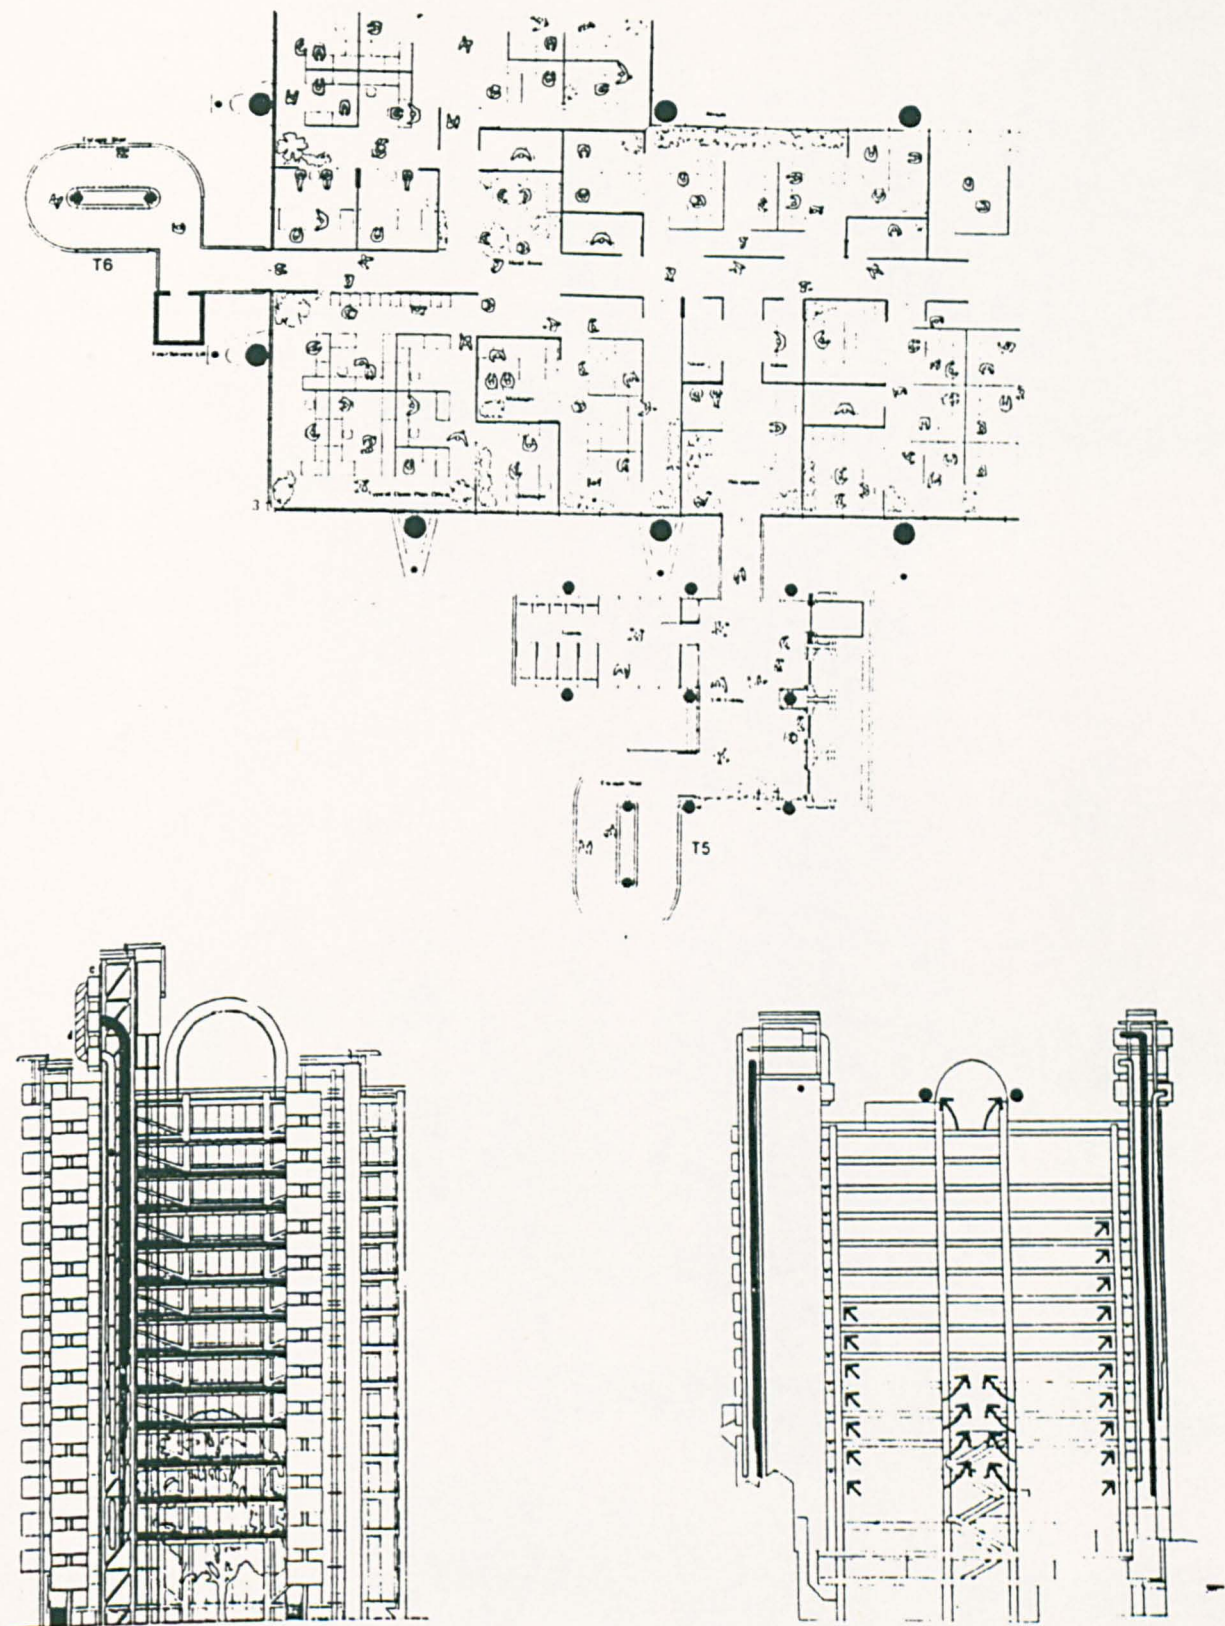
Richard Rogers Partnership, Lloyd's of London building. Above, part plan of typical office floor; below left, section showing (a) supply air; (b) return air; (c) tower air handling plant; (d) recirculating duct. Below right, diagram of extract system hot air drawn up atrium by chimney effect.
